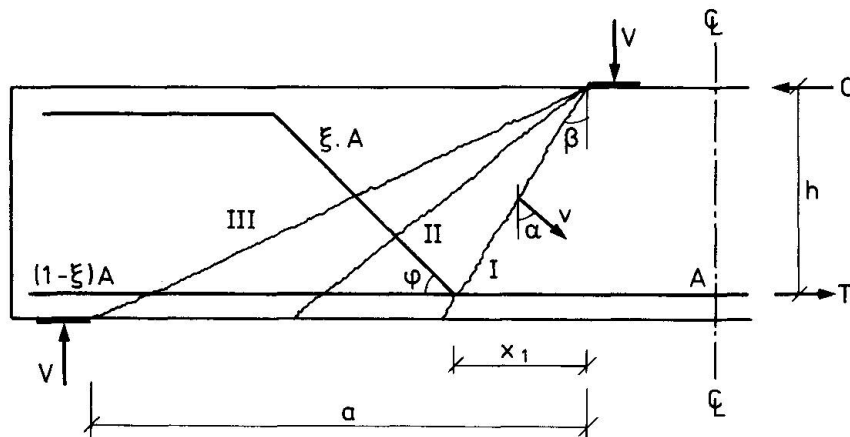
Failure Mechanisms for Beams with only one Bent-up Bar.
